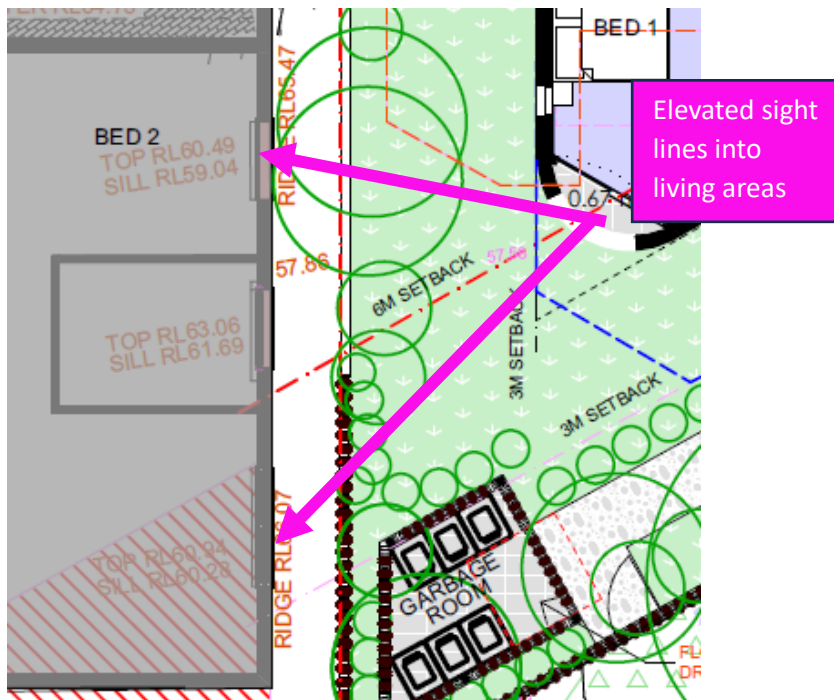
Elevated sightline from Unit 101 into 1/72A bedroom/living area
